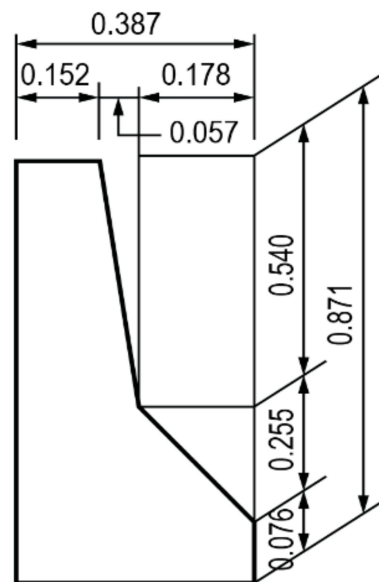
Standard American Iron and Steel Institute (AISI) parapet used for the bridge models (in meter).
